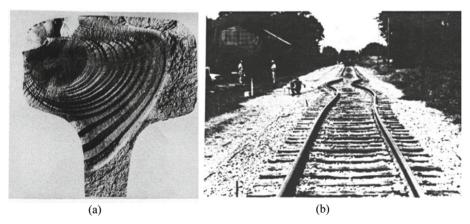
(a) Fracture surface on the rail [11] and (b) buckled track caused by the high thermal condition [10].
